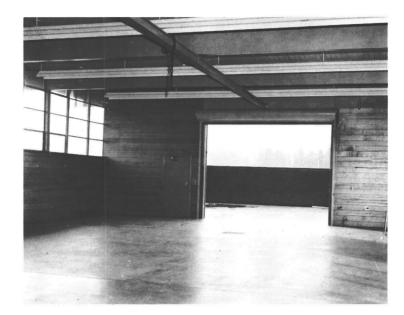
Note space below windows for placement of work benches, tool cabinets, and equipment.
